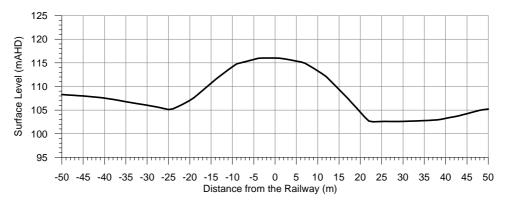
Cross-section through Embankment 76.2 km - Looking East (Up Track)
